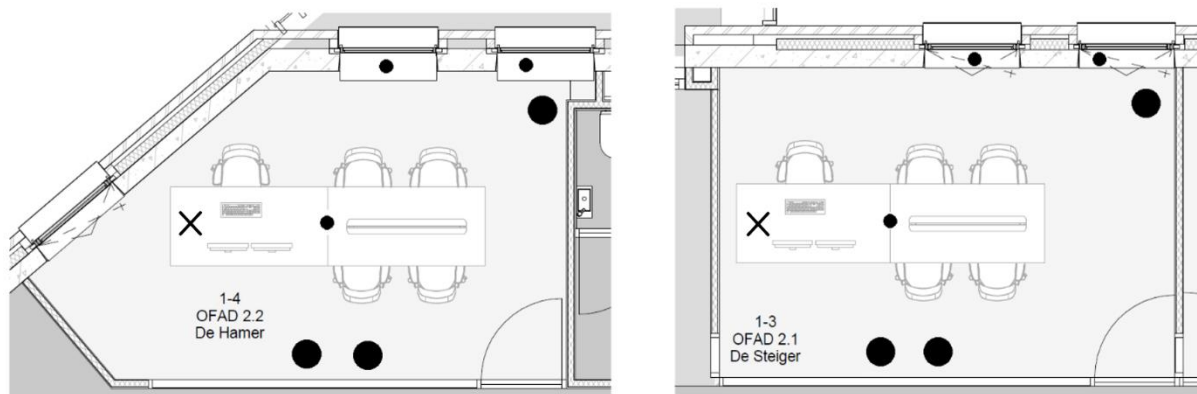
Room arrangement for plant and no-plant condition – Study 2
